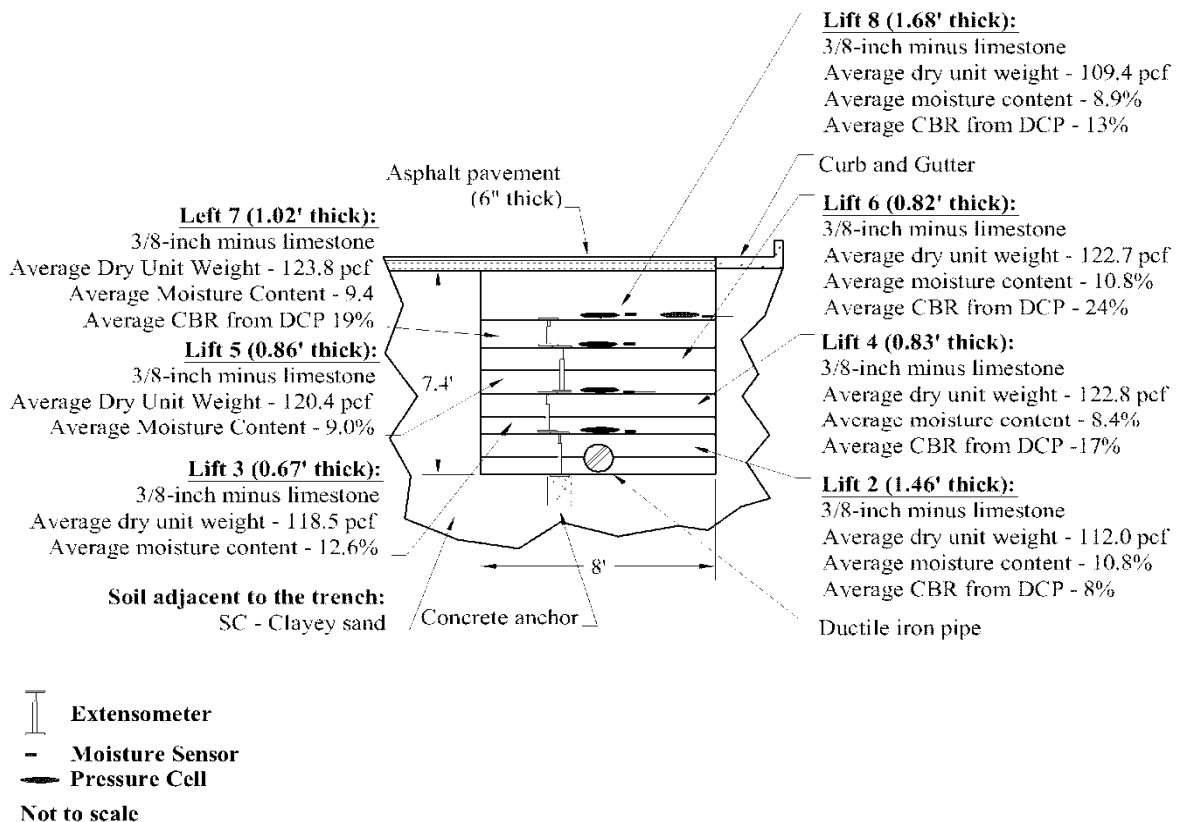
East-west cross-section of completed Trench BI with testing results
